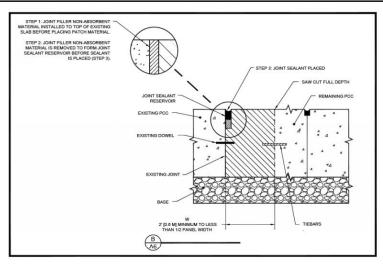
Full depth repair in rigid pavement - partial slab replacement
